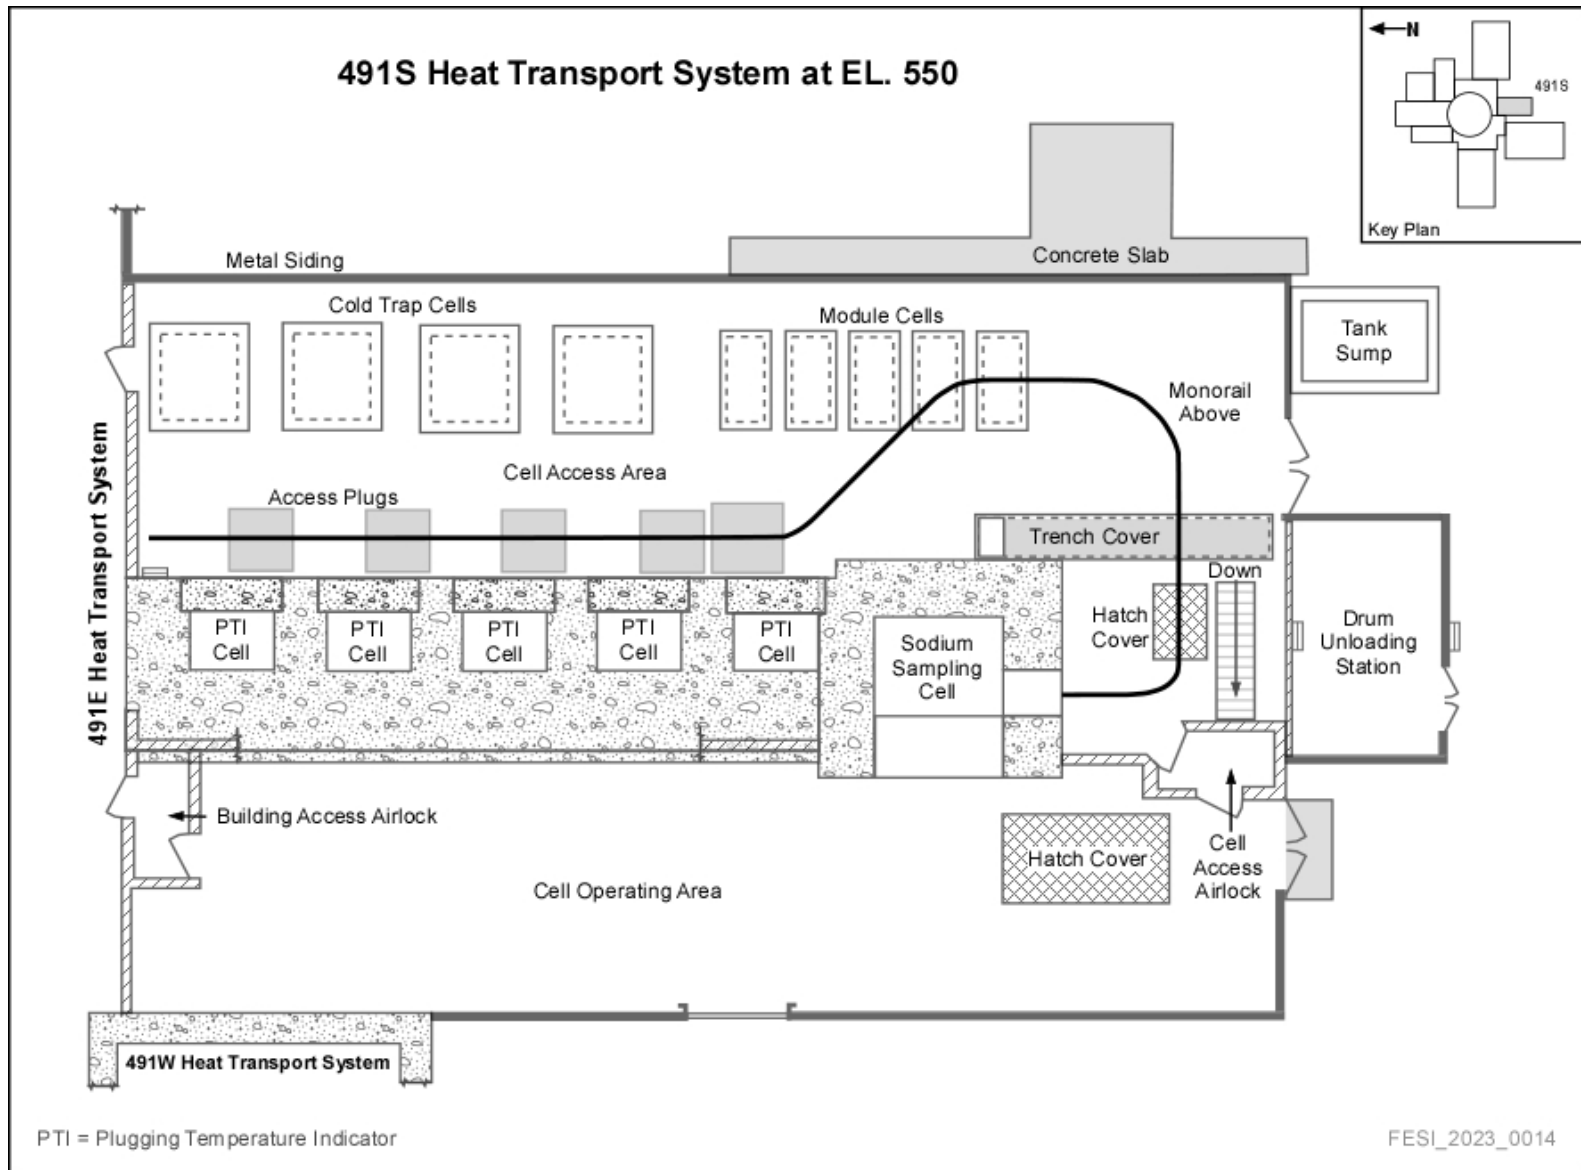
Plan View of 491S Heat Transport System Service Building (550 ft Elevation)
